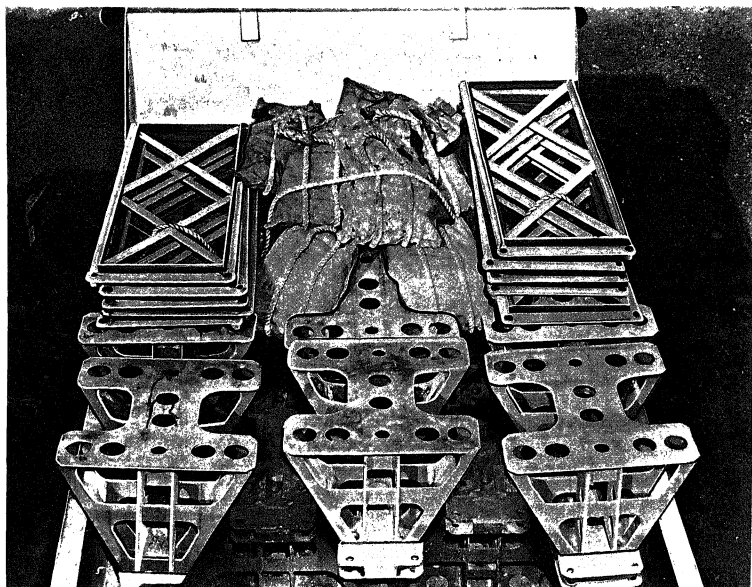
Truck load No. 9—Overhead bracing load on 5-ton truck.
